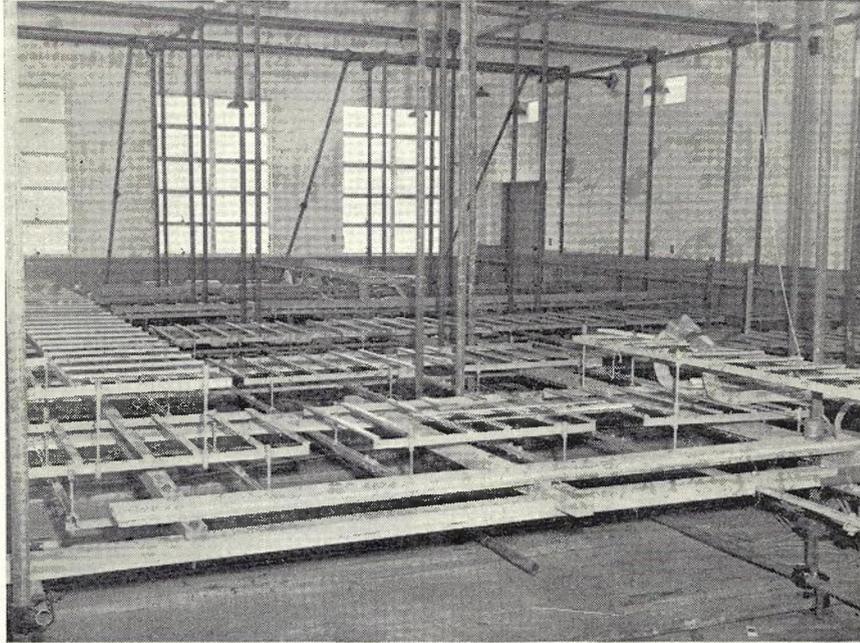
Structure lifted to cabling height and cabling commenced.
